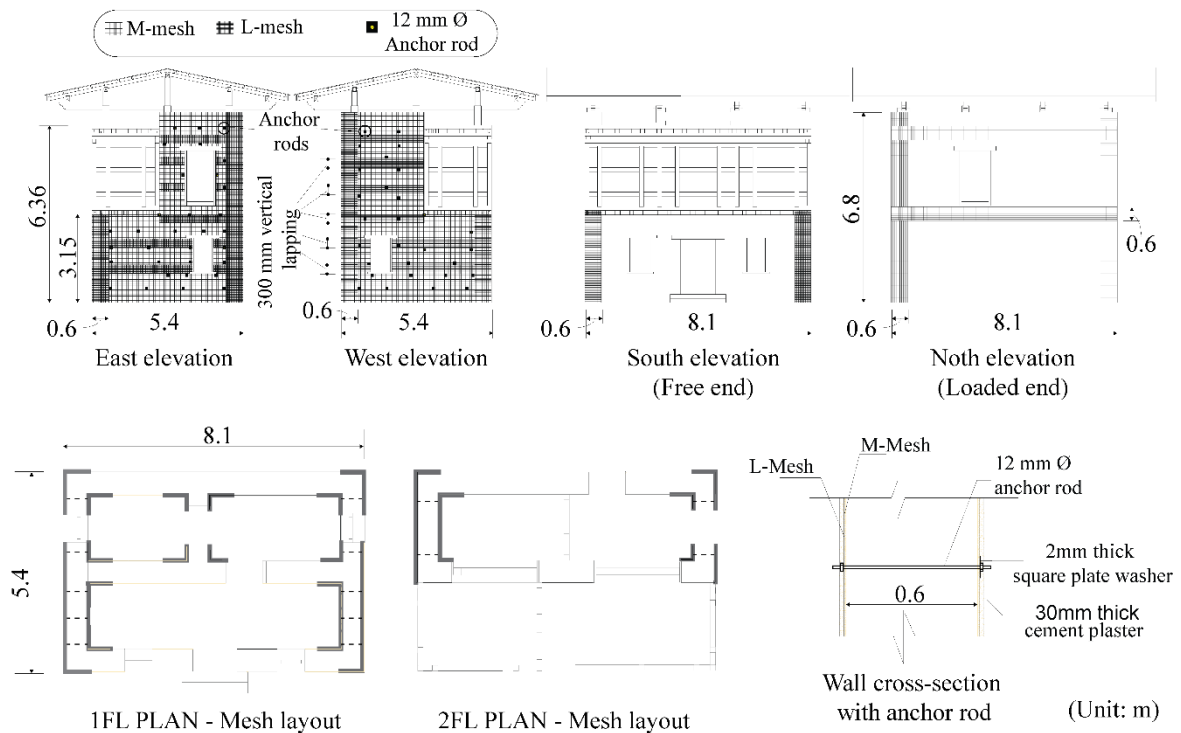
Prototype retrofitted rammed earth building specimen (RRE)
